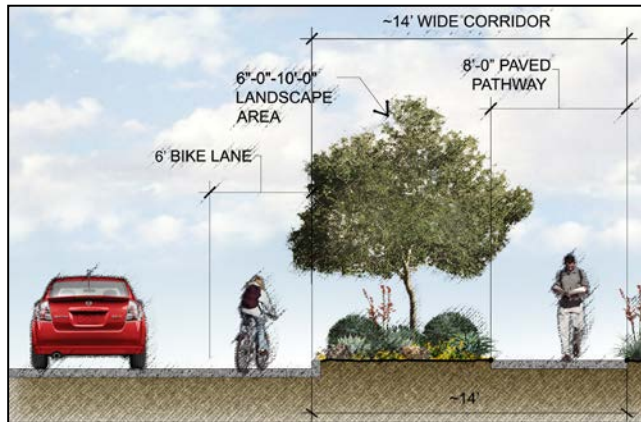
Anza Trail River Park Cross-Section Typical Detail
